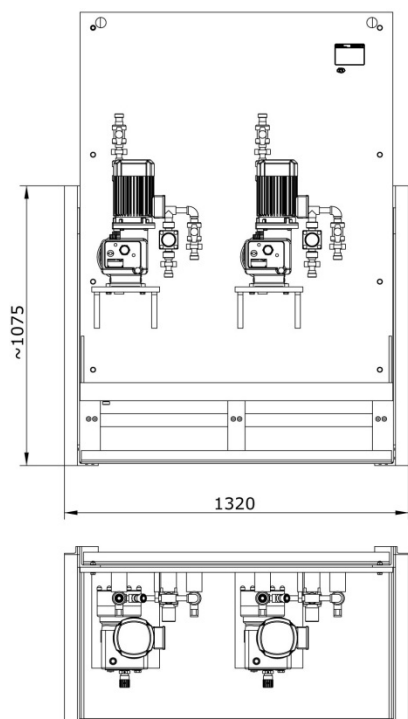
Dimensions of the CVD2 (floor mounting, GFK stand)
